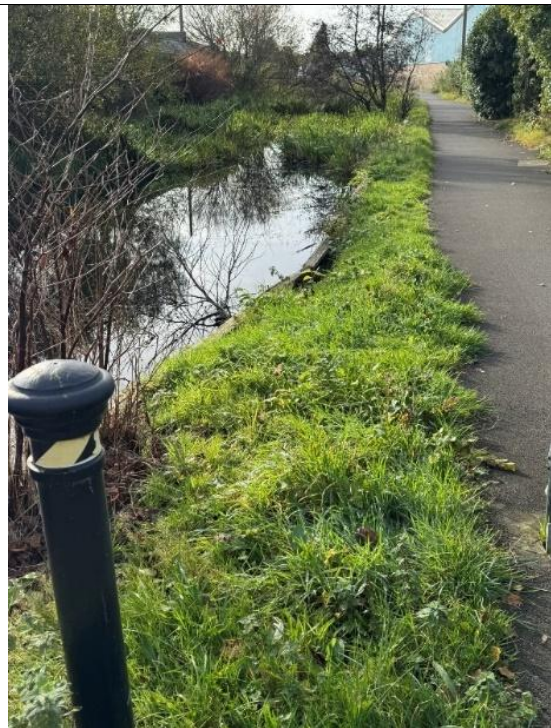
Bridge Street Bridge canal condition with rotten wood supporting canal embankment
